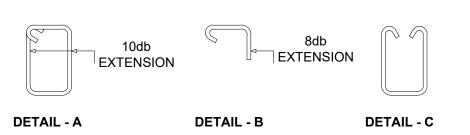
TYPICAL BAR DETAILS FOR PRISMATIC GIRDERS
